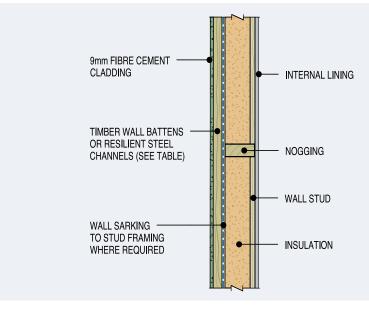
9 mm Fibre Cement Cladding. Vertical section through wall
